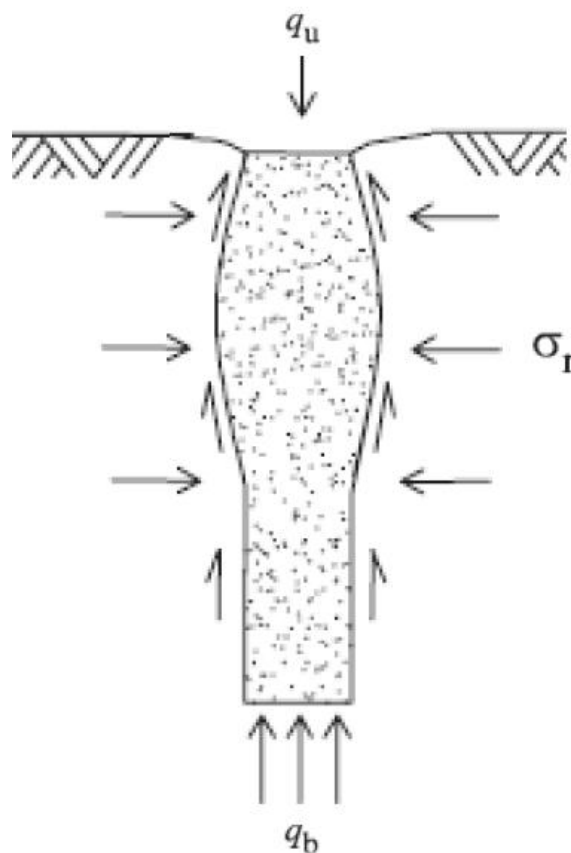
Load transfer mechanisms of Stone Column adapted from (McCabe, 2007)
